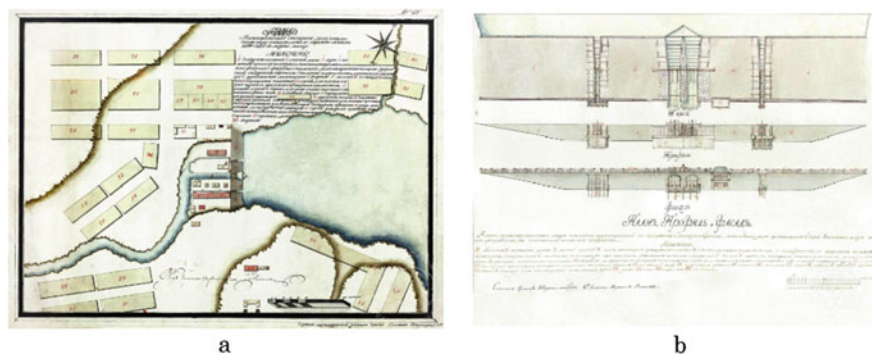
a Plan of the Nizhne-Isetsy plant. 1807 Source https://xn--80aebf3an9auge0i.xn--p1ai/german_2 b Nizhne-Isetskaya dam in the 1800s Source https://xn--80aebf3an9auge0i.xn--p1ai/german_2
